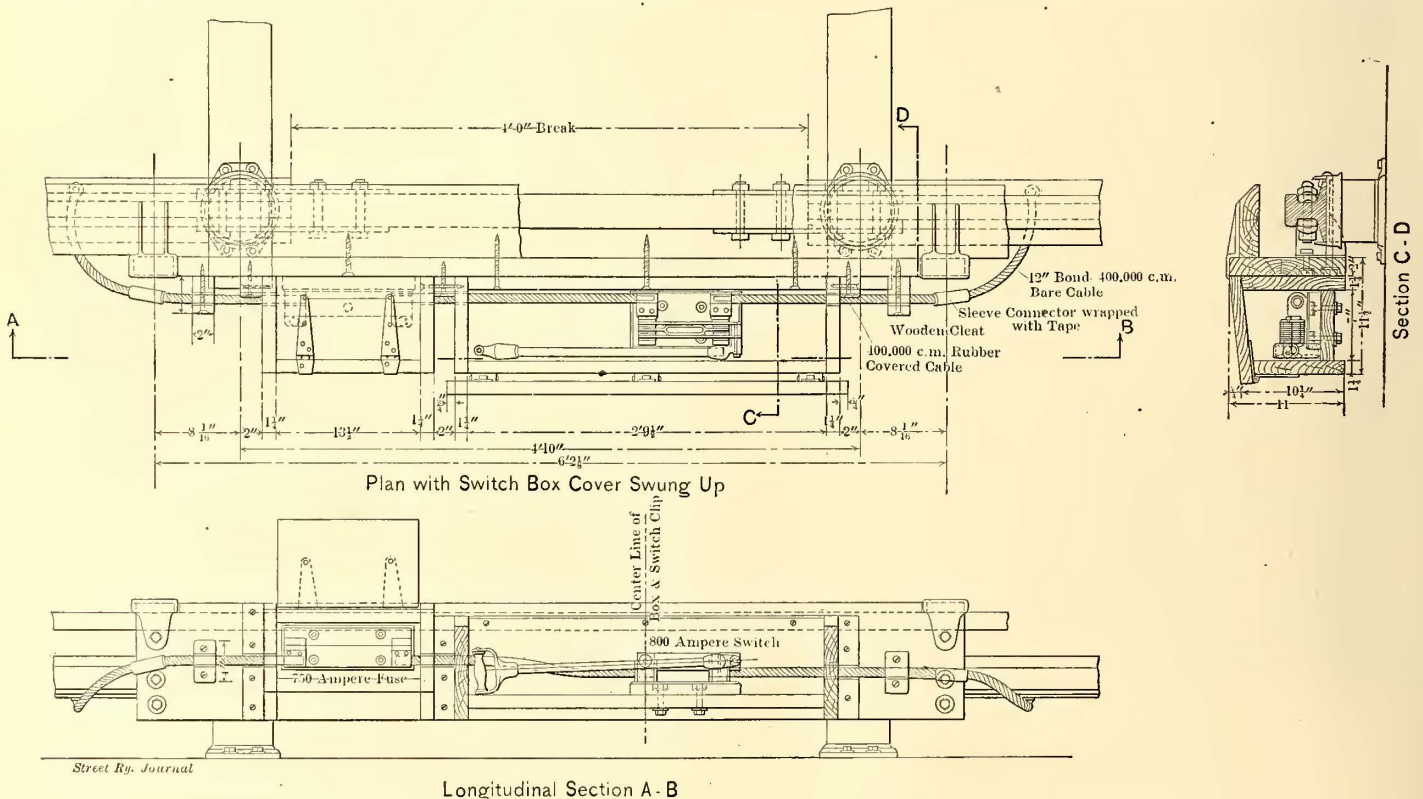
THIRD RAIL DISCONNECTING SWITCH AND FUSE
